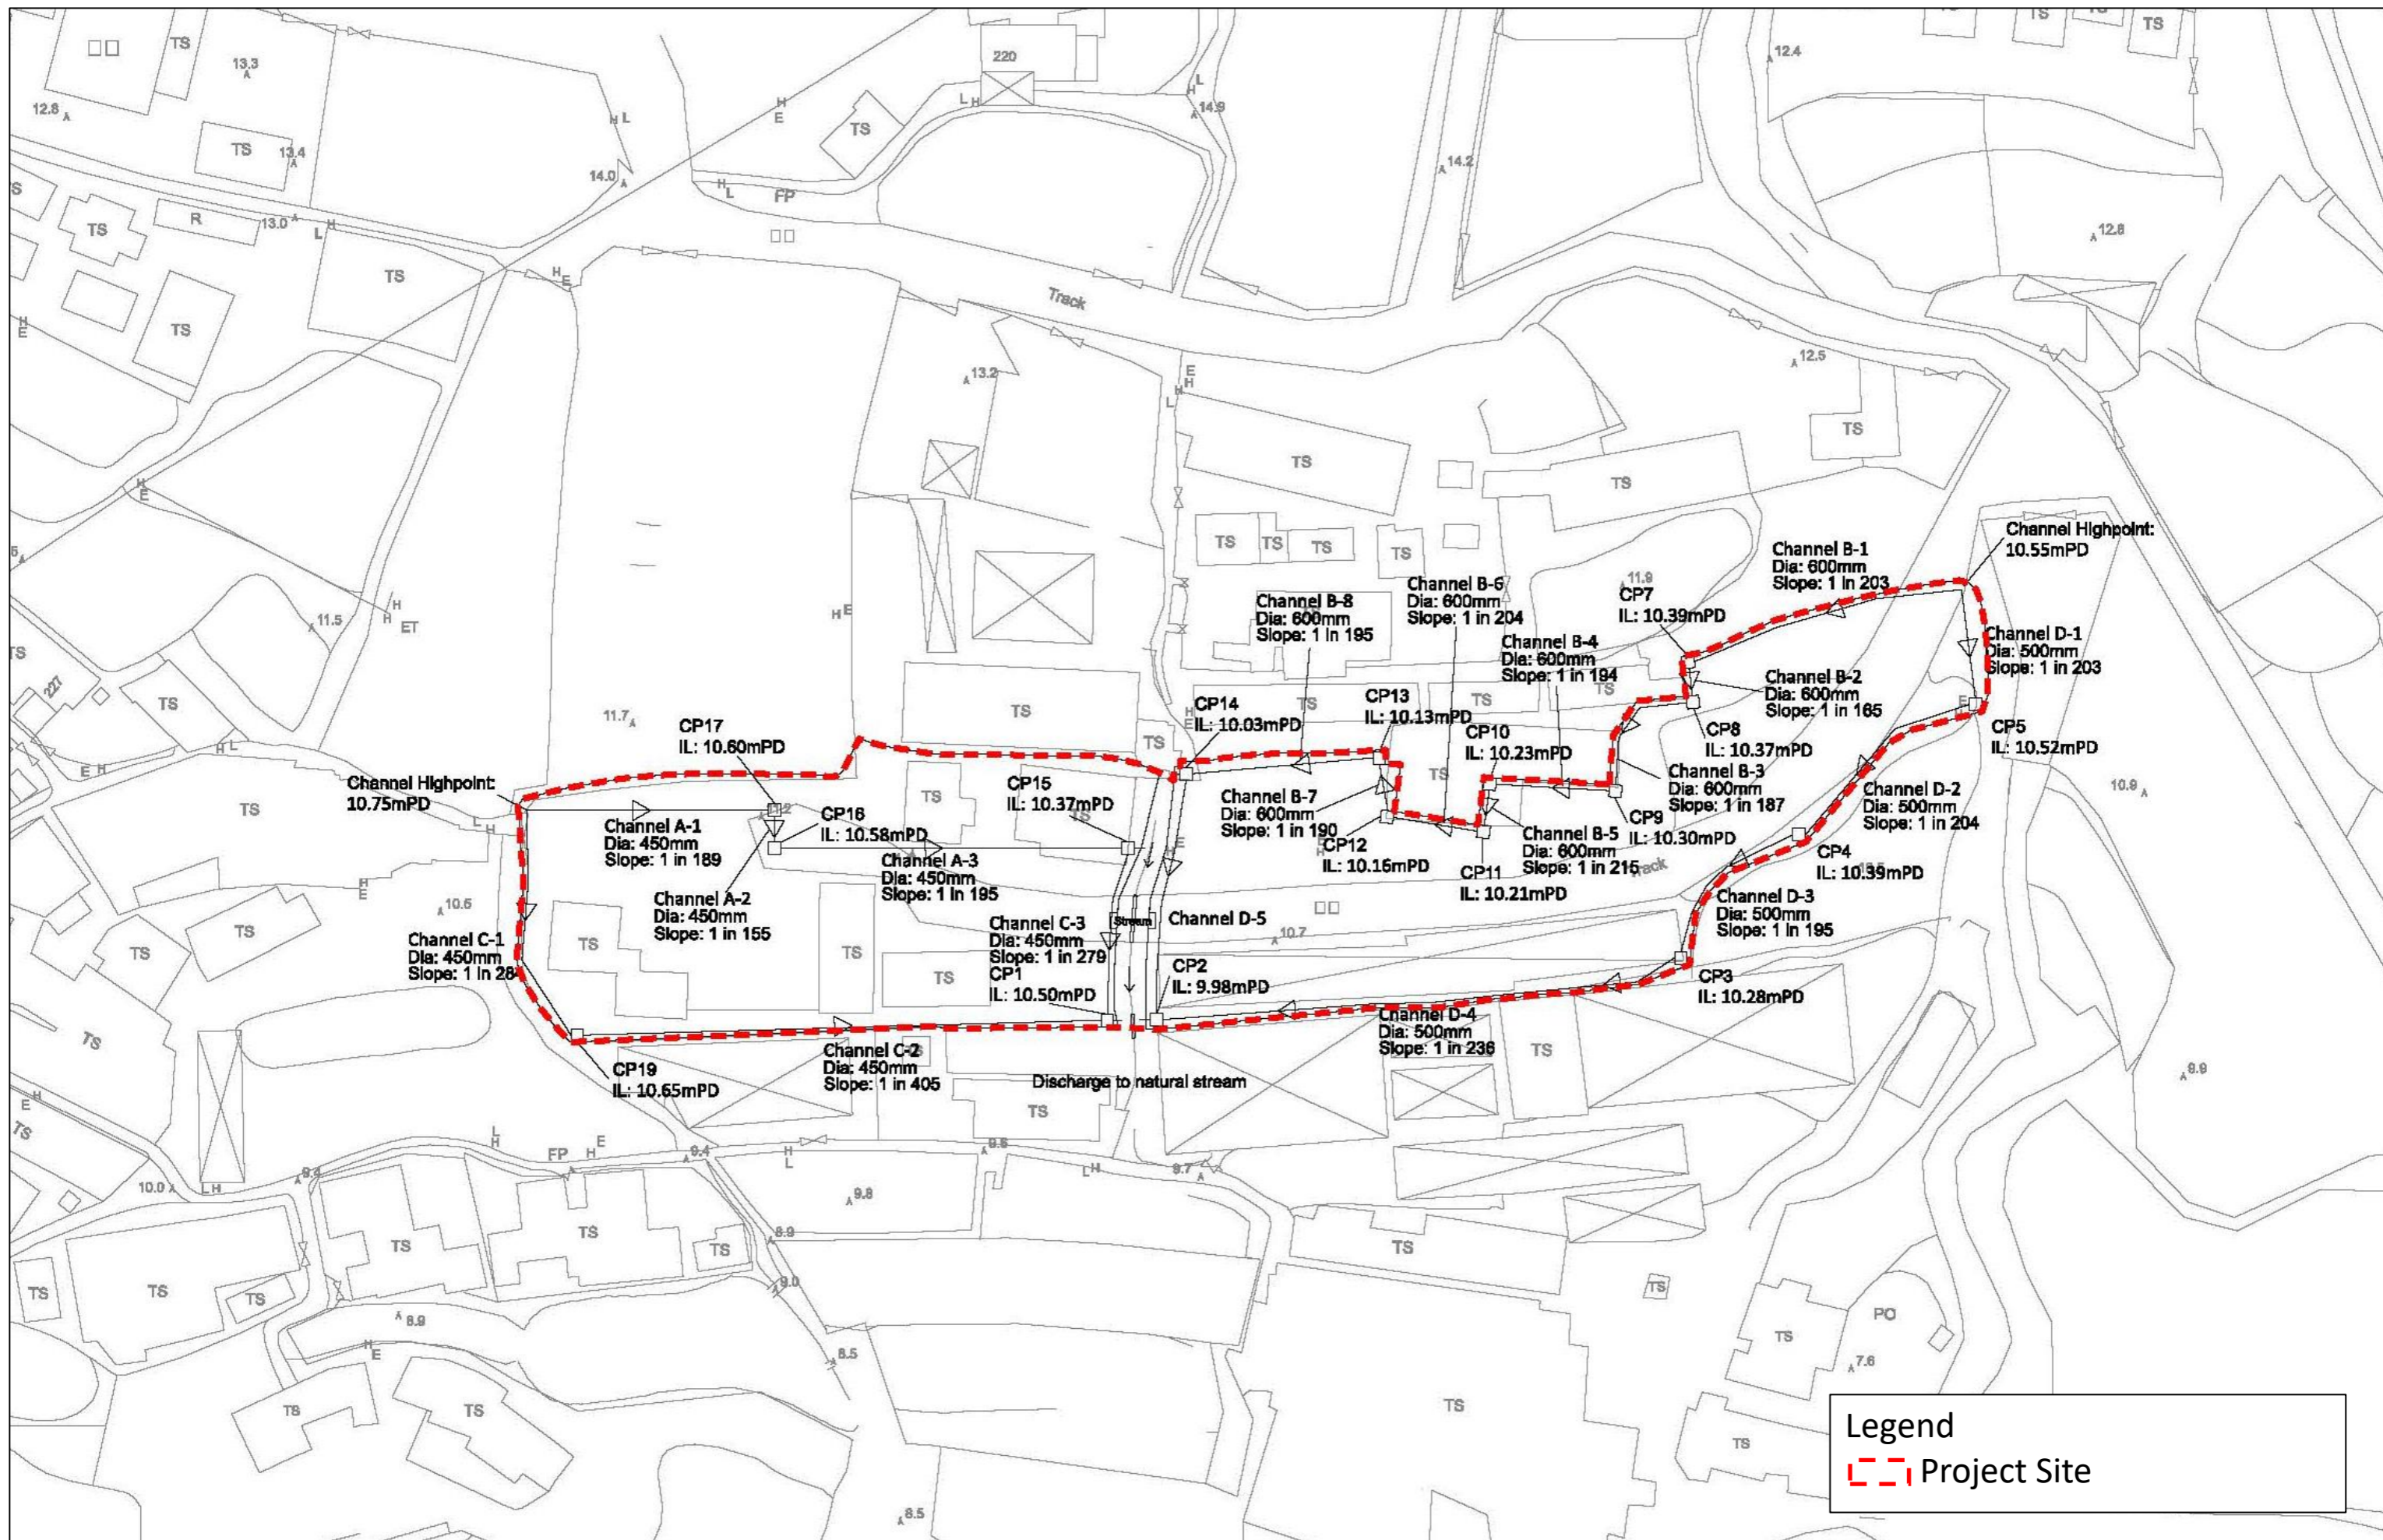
Proposed Layout of the Drainage Channel for the Project Site
